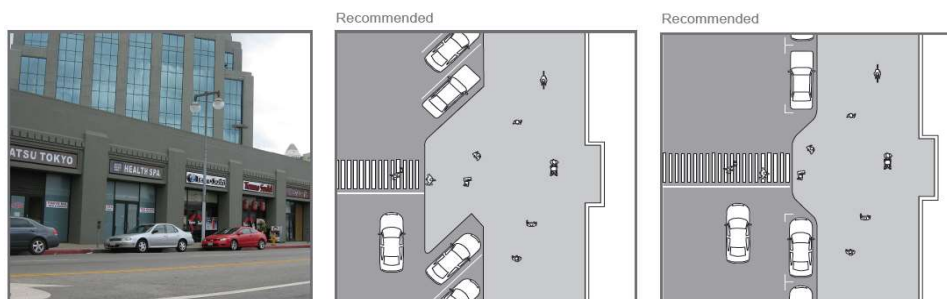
, On-street parking and its effect on sidewalk width and street crossing. (LA-Walkability Checklist, 2008: 22)
